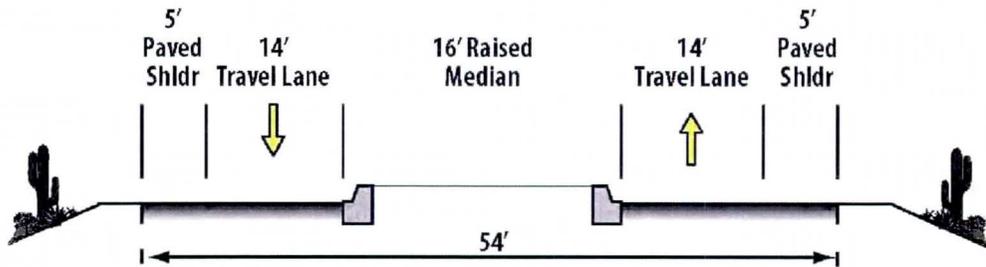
Interim Cross Section: Southern Avenue to Germann Road
